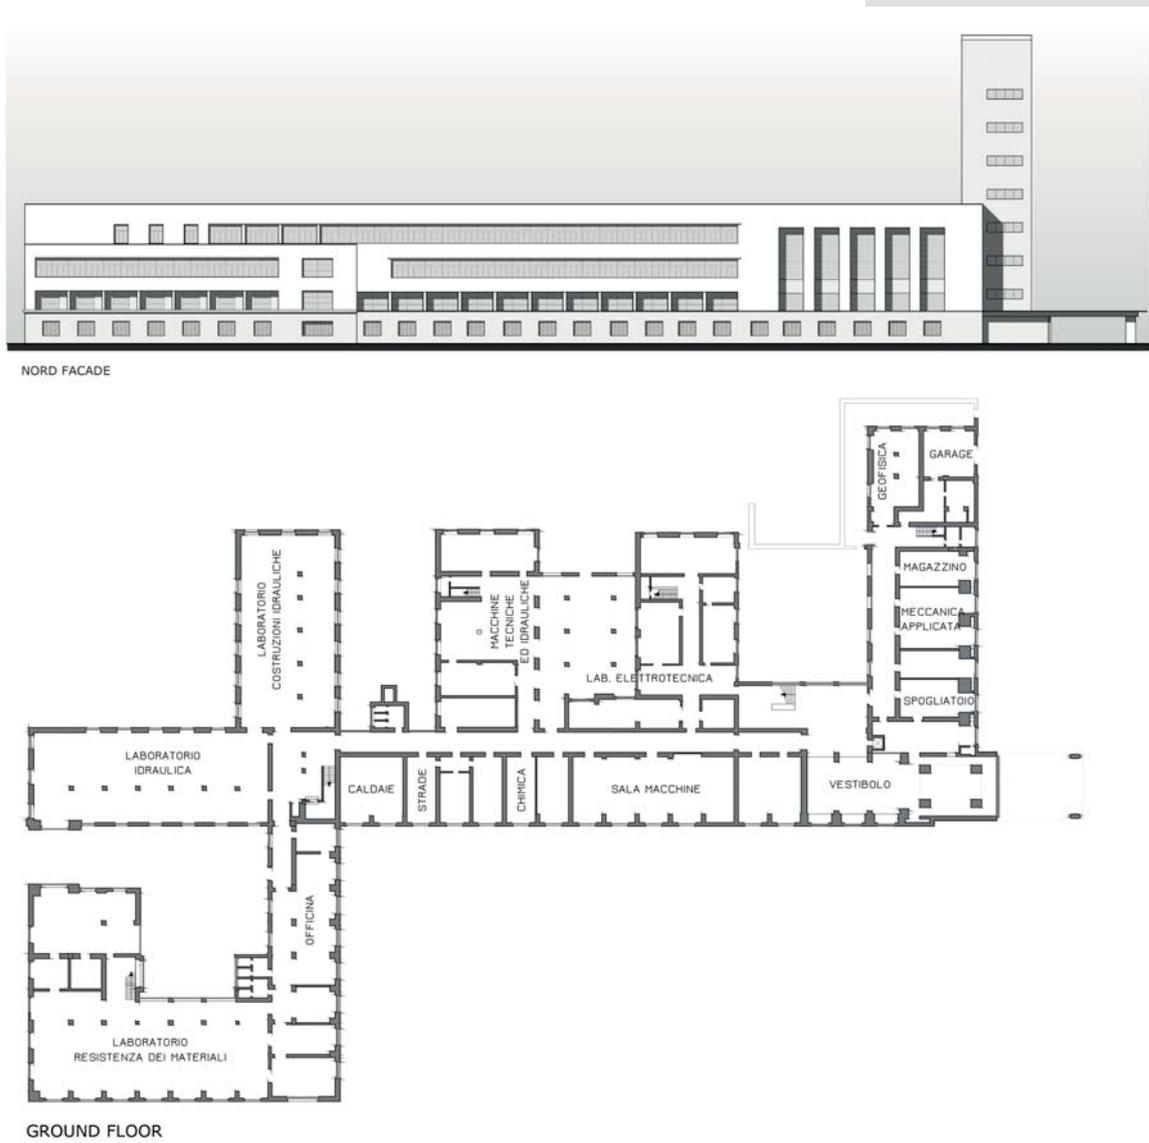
The Faculty of Engineering in Bologna: ground floor and main facade.
